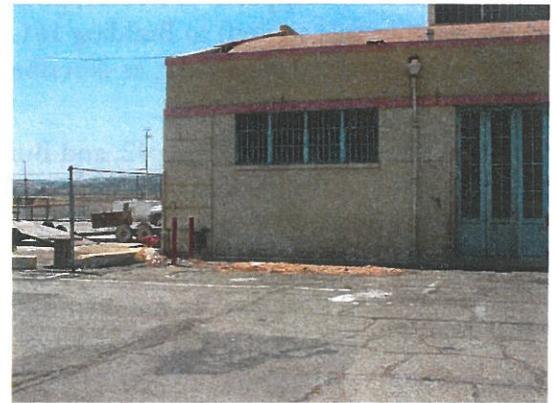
Looking south at suspected former AST location, northwest corner of Building 89. Photo taken 5/28/2004.
